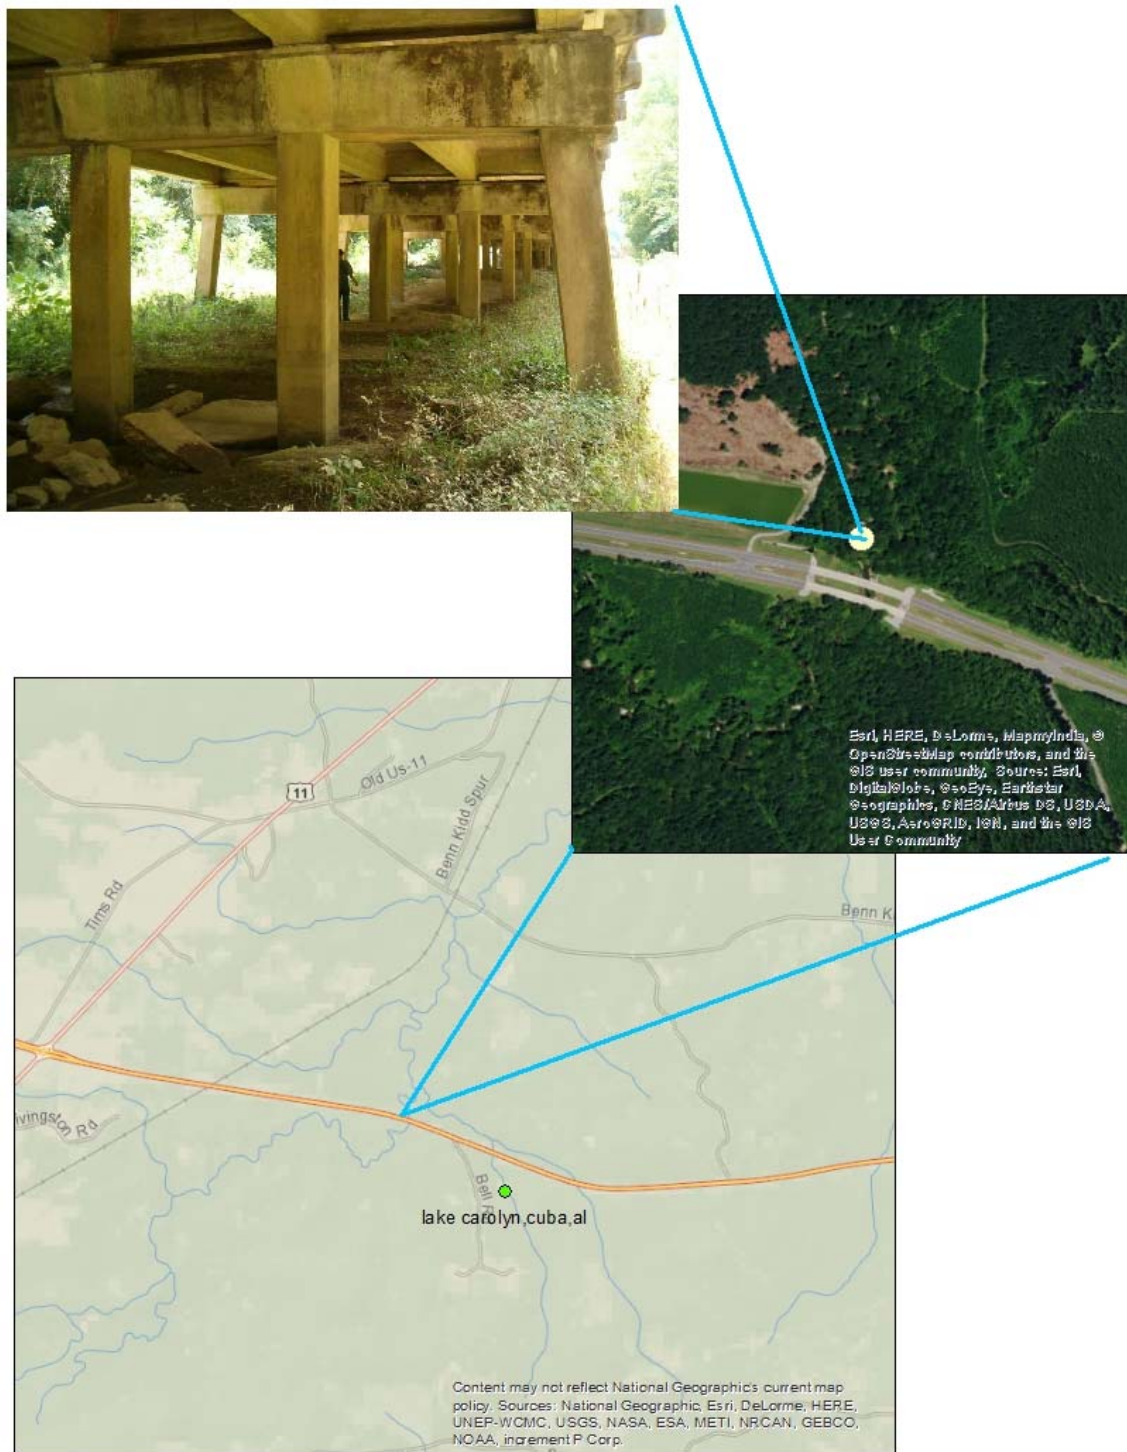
Location of Alamuchee Creek and bridge site characteristics.
